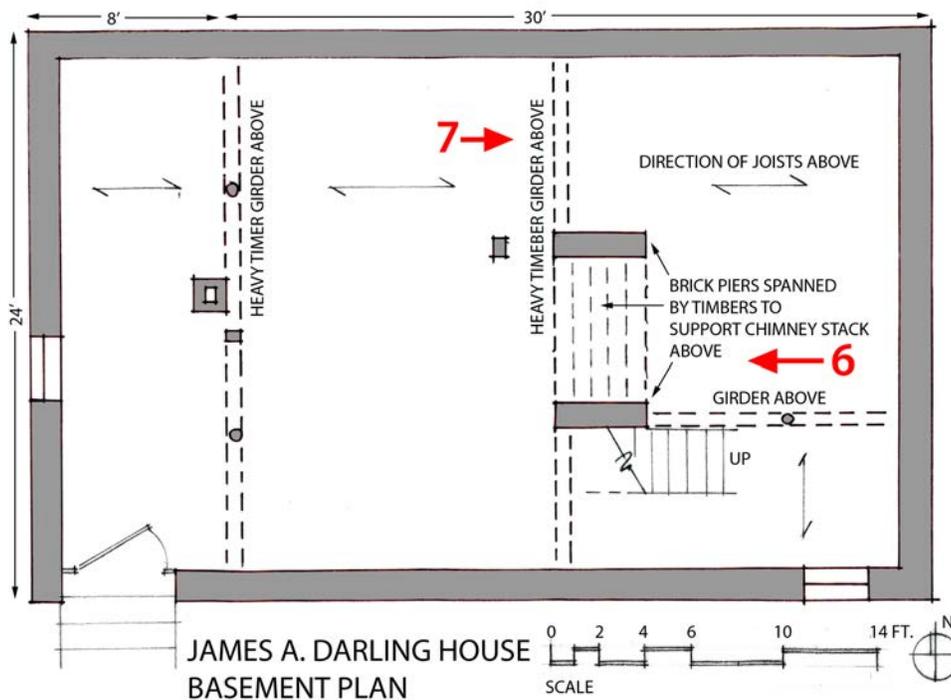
Basement floor plan, James Alexis Darling House, 1932 Litchfield Turnpike, Woodbridge, CT with photograph key.
